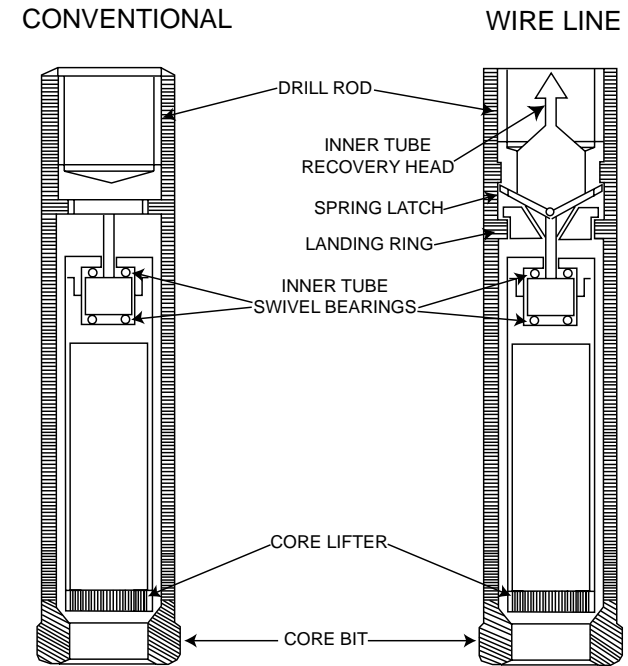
1. Conventional and wire-line core barrels.
